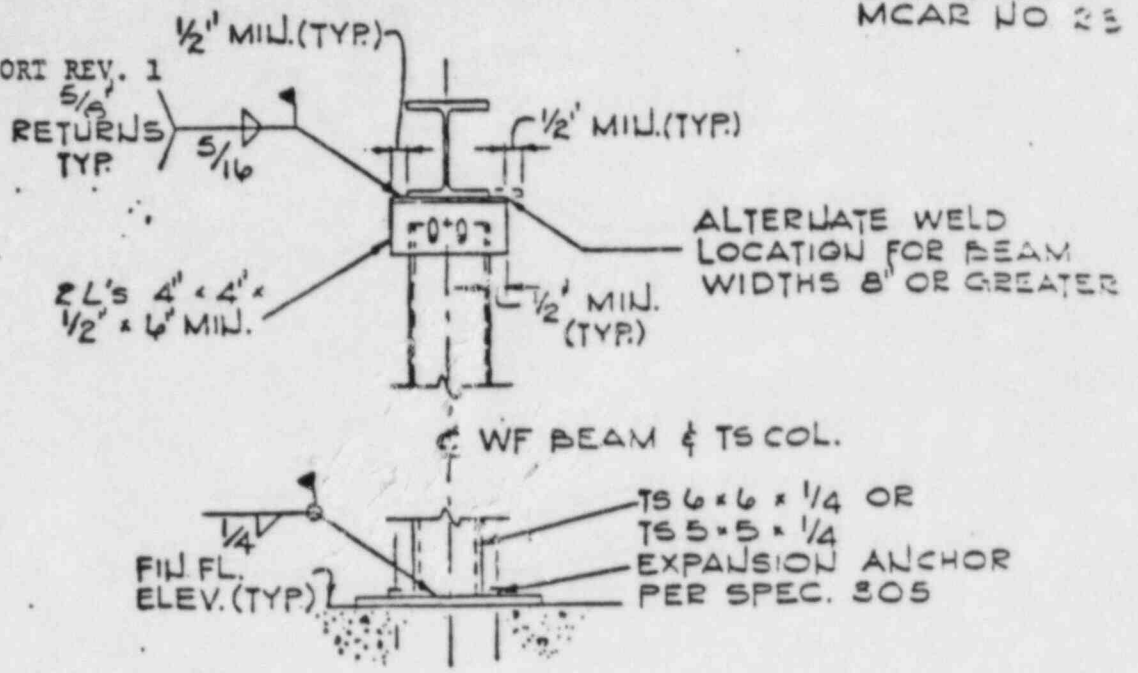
TYPICAL UPPER & LOWER SUPPORT COLUMN CONNECTION
